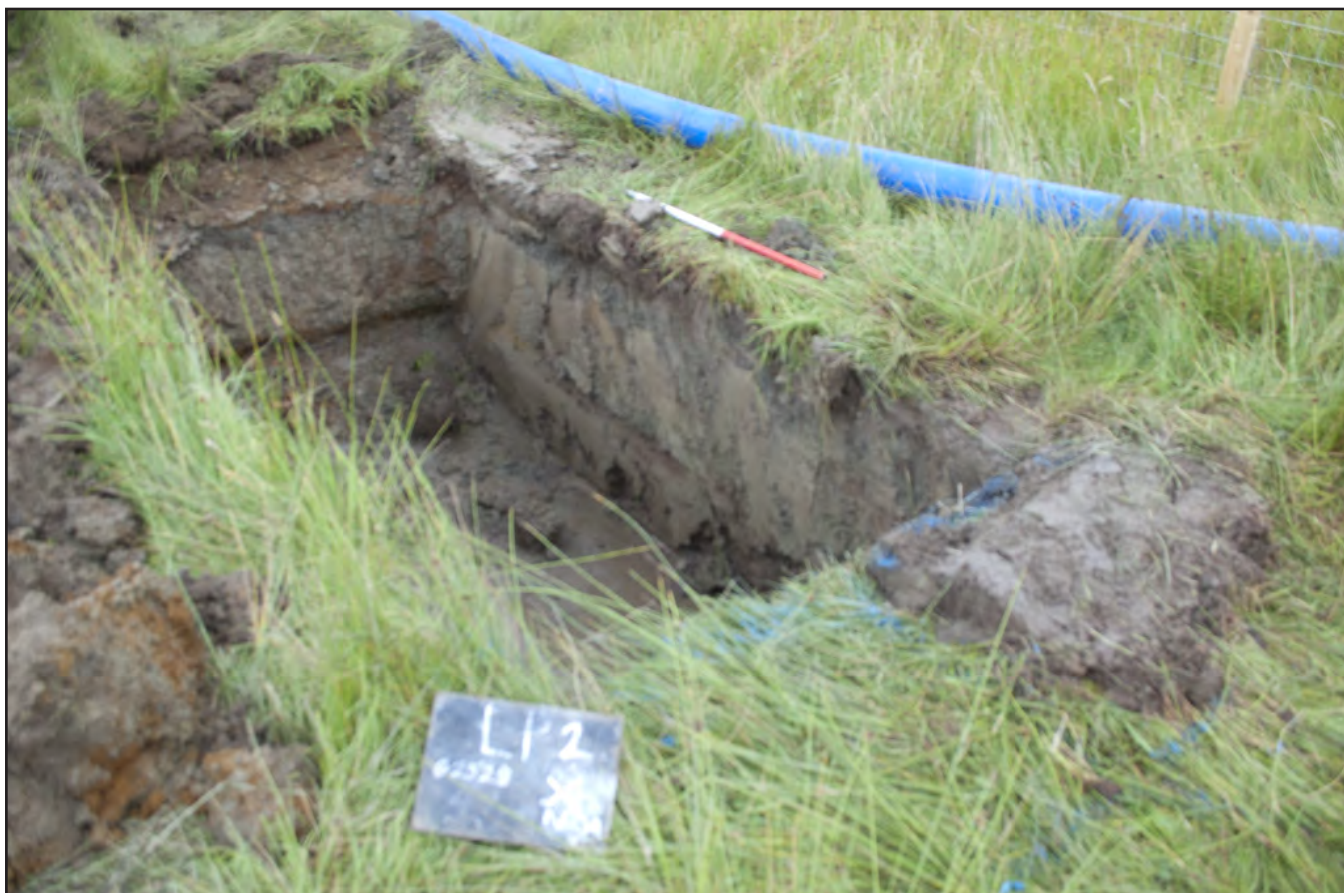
launch pit 2 - view from north post-excavation (scale: 1.0m; archive image: G2528\_009).
